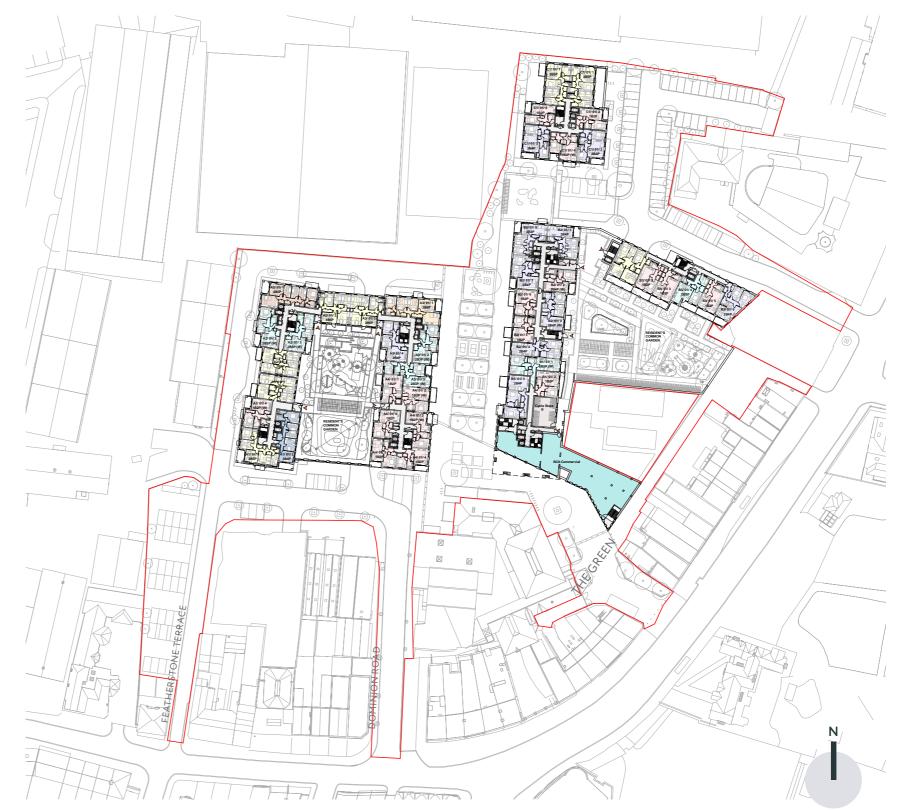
TYPICAL UPPER FLOOR PLAN
